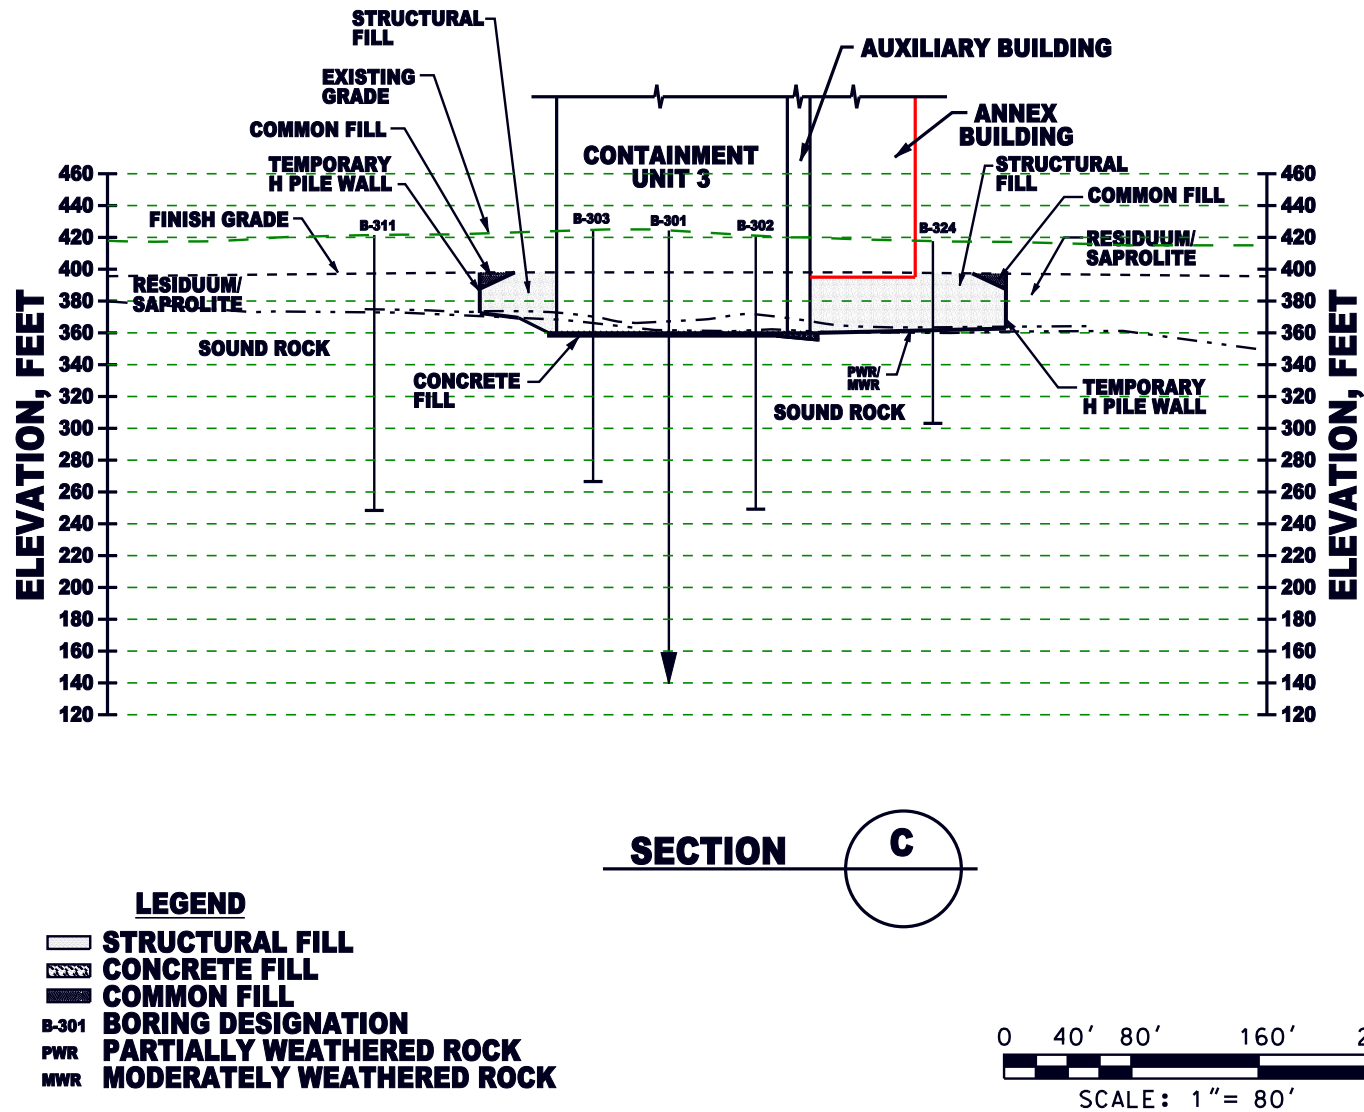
Cross-Section of Structure Foundation C-C
